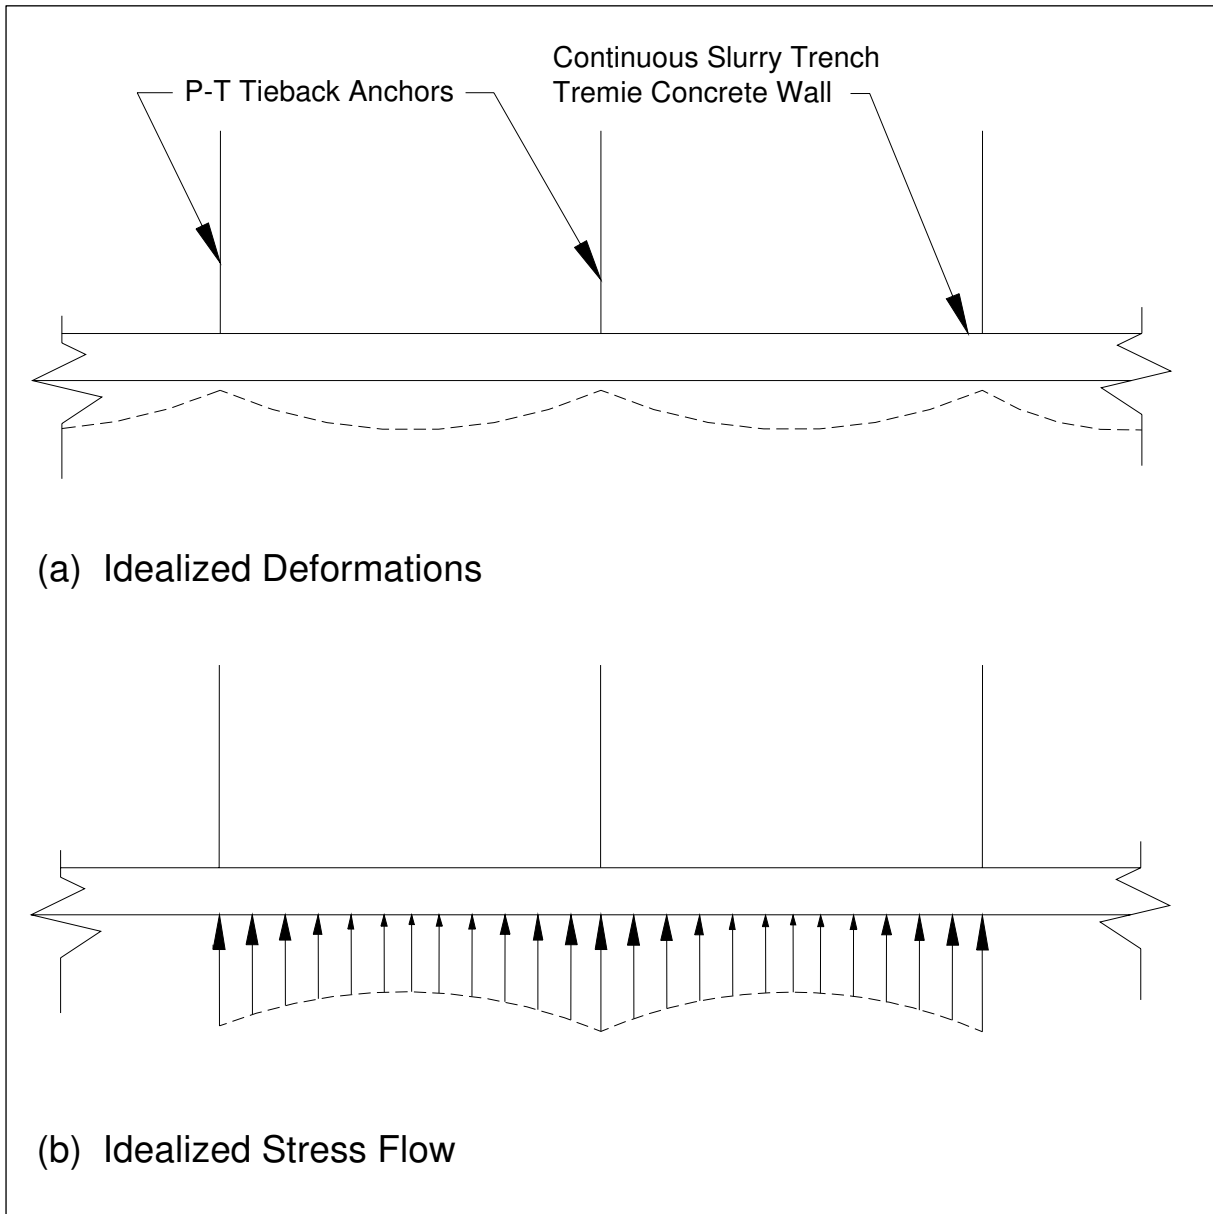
3-D effects on continuous slurry trench, tremie concrete wall
